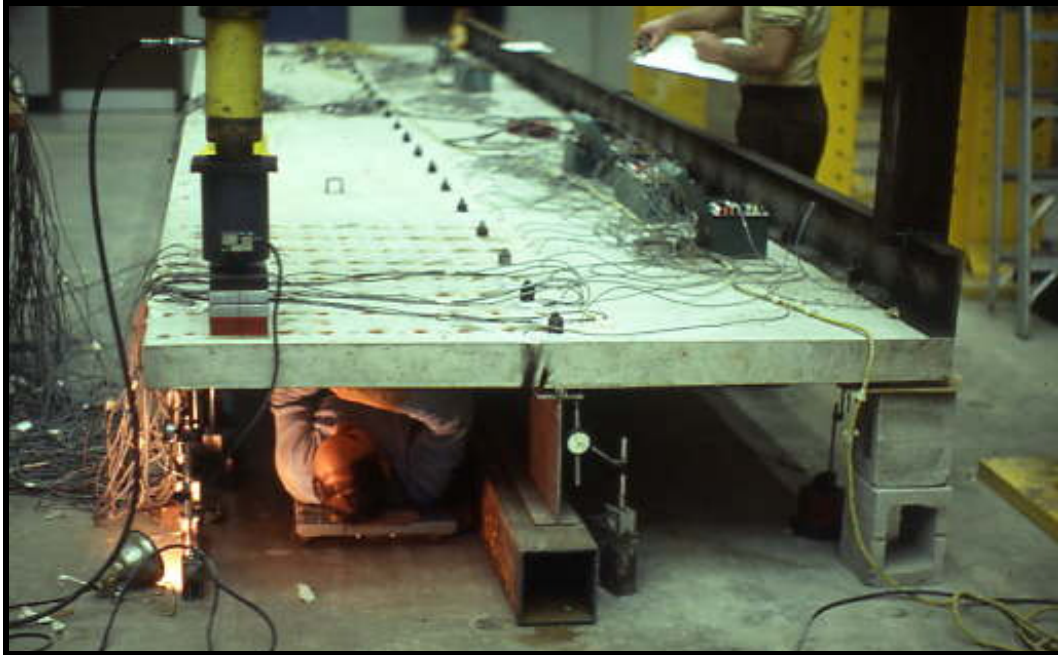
Photograph illustrating experimental test set-up for mirror-image model of a cantilever deck slab with only one girder (Drysdale, 1982)
